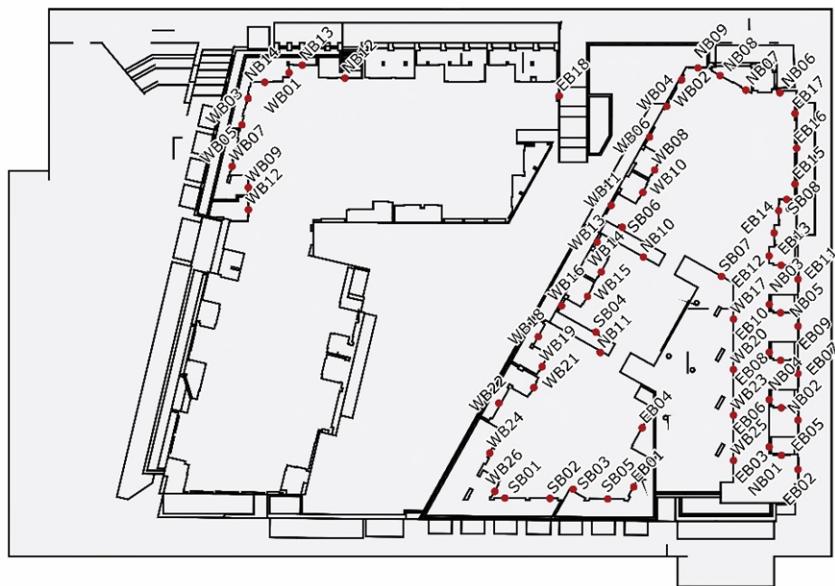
Layout of Pressure Sensors – West Elevation
